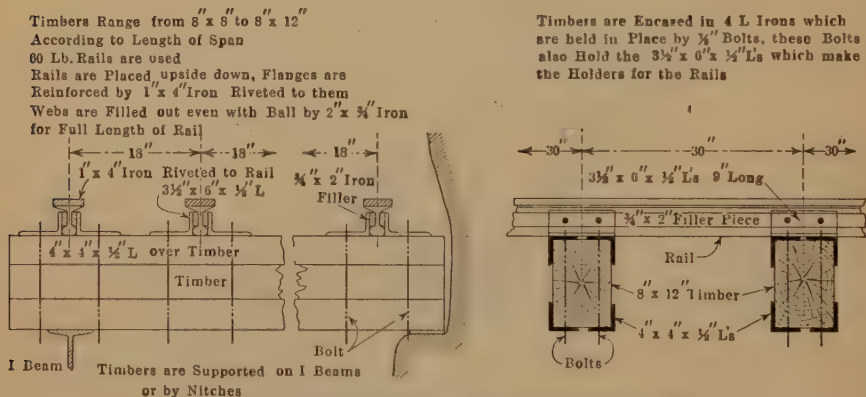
DETAIL OF GRIZZLY CONSTRUCTION.
